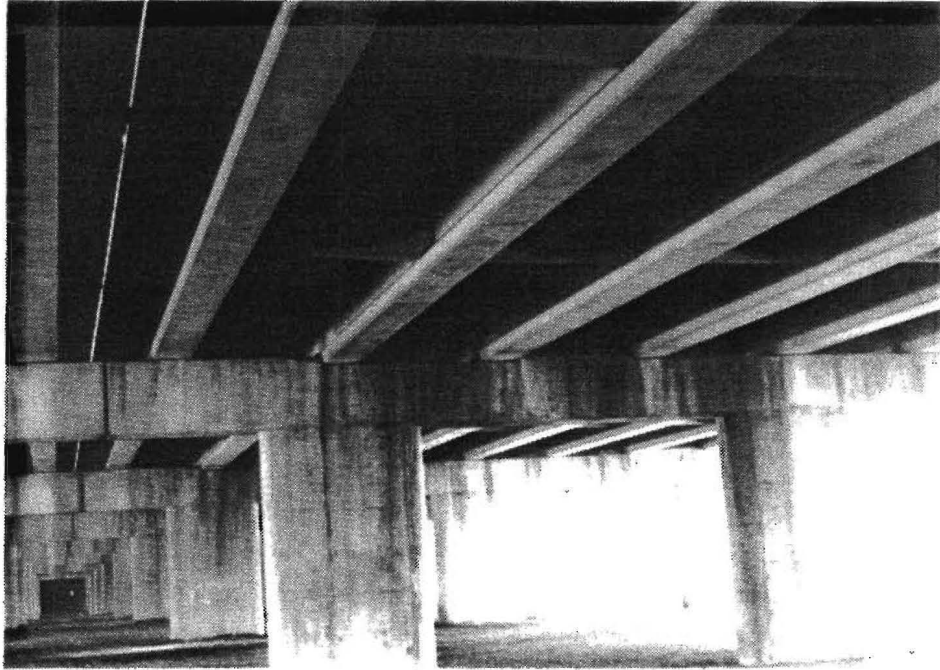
Underside of Bridge Deck (Falling Seals)
